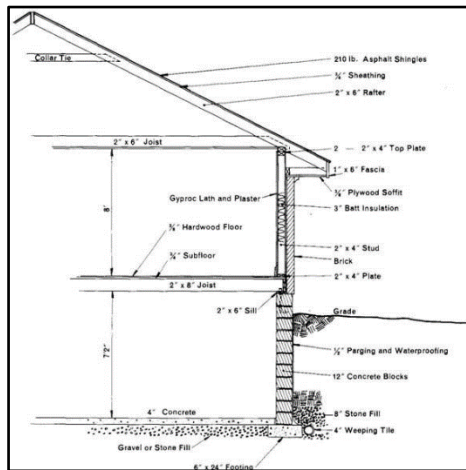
Sample of a Detail drawing that has some features from an Elevation plan
